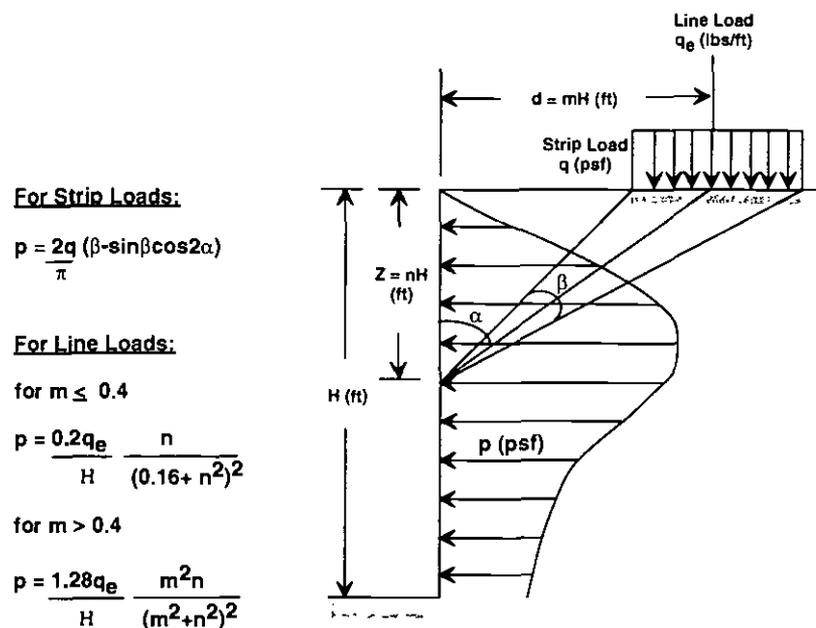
Lateral Surcharge Pressures from Adjacent Vertical Loading
